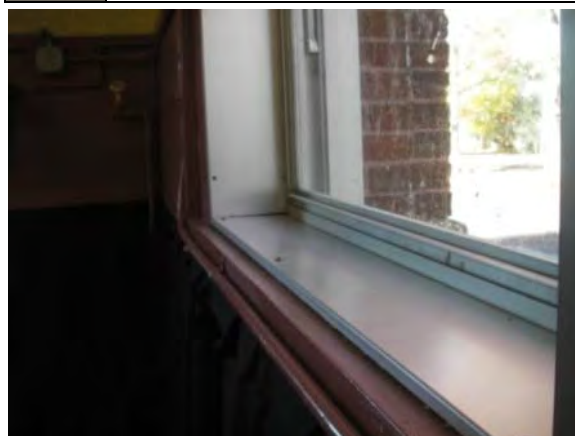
1902 BUILDING ALUMINUM SINGLE-PANE WINDOW AND FRAME
